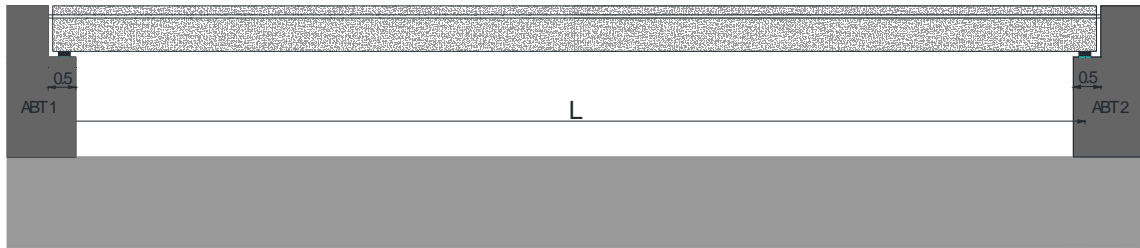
Longitudinal Section of a T-and Box- Girder Bridge
